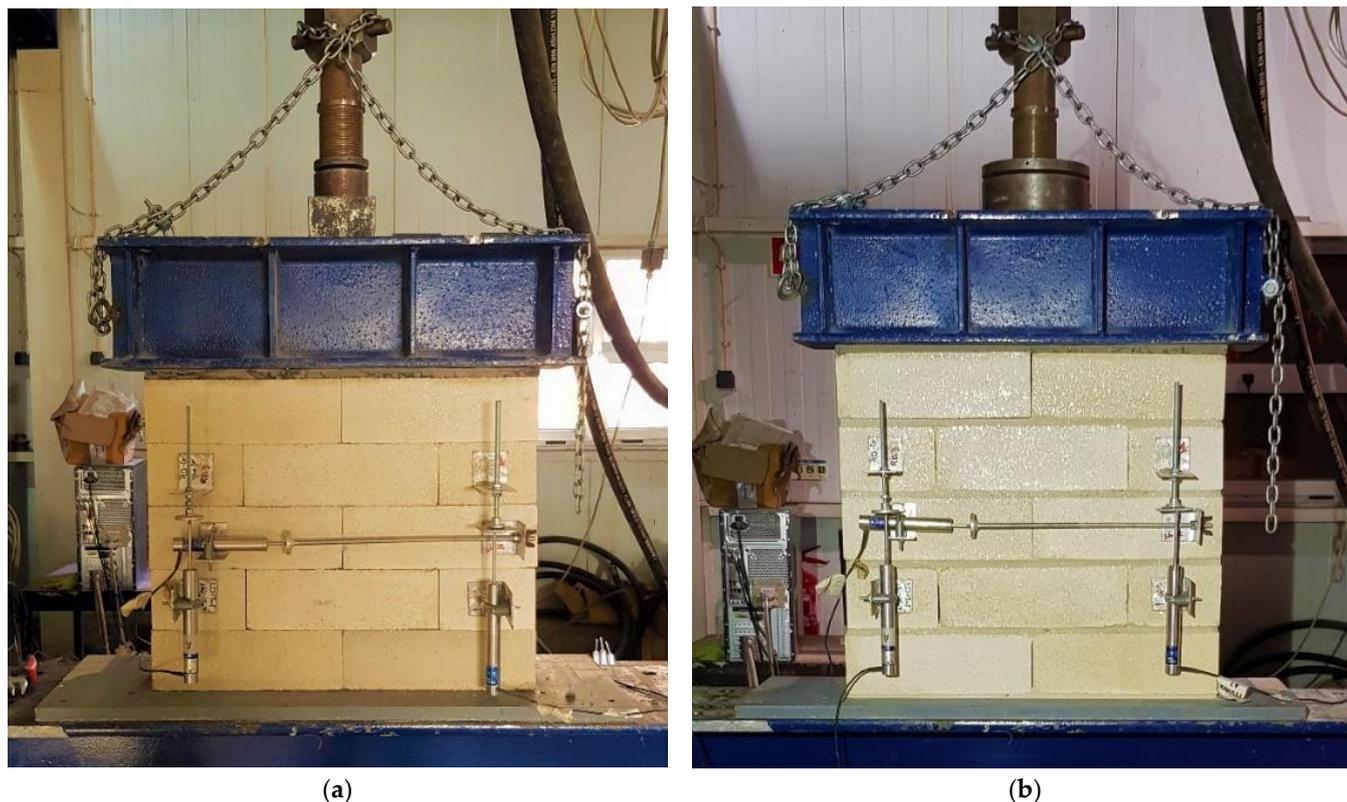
Setup of the compression tests conducted on masonry wallettes: (a) DSW and (b) MW.
